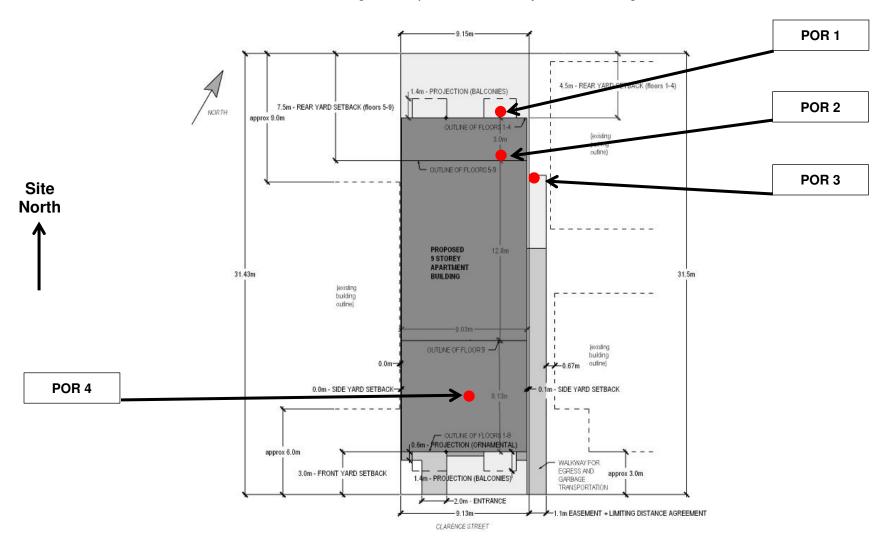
Building Floor Plans showing Points of Reception (Source: Art House Developments)
